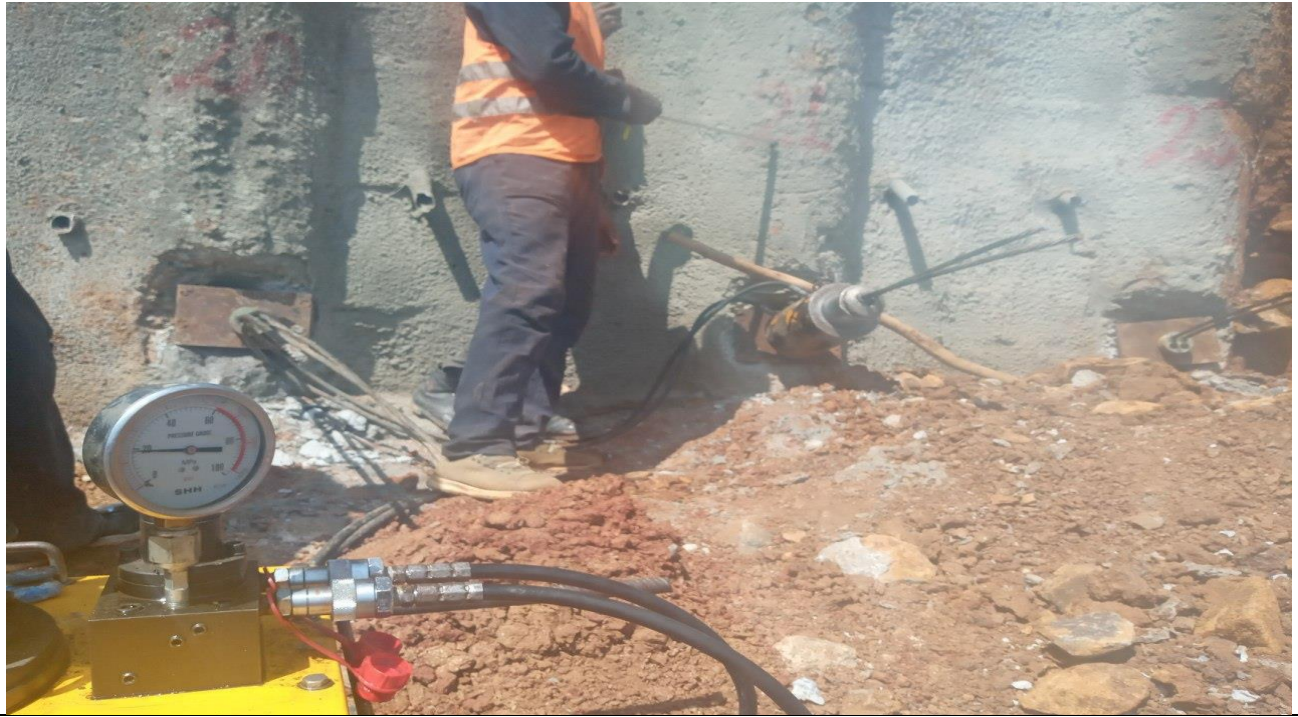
ANCHOR LOCKING AND PILE CORE ANCHORED PILES VIEW
